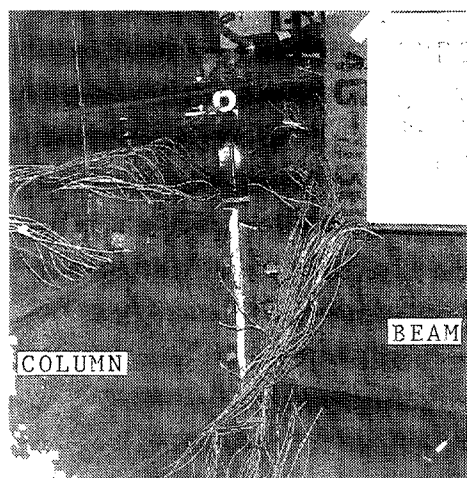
Panel zone deformation after test (SPEC. XF1N-C)
